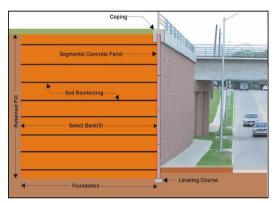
MSE WALLS: TYPICAL COMPONENTS
